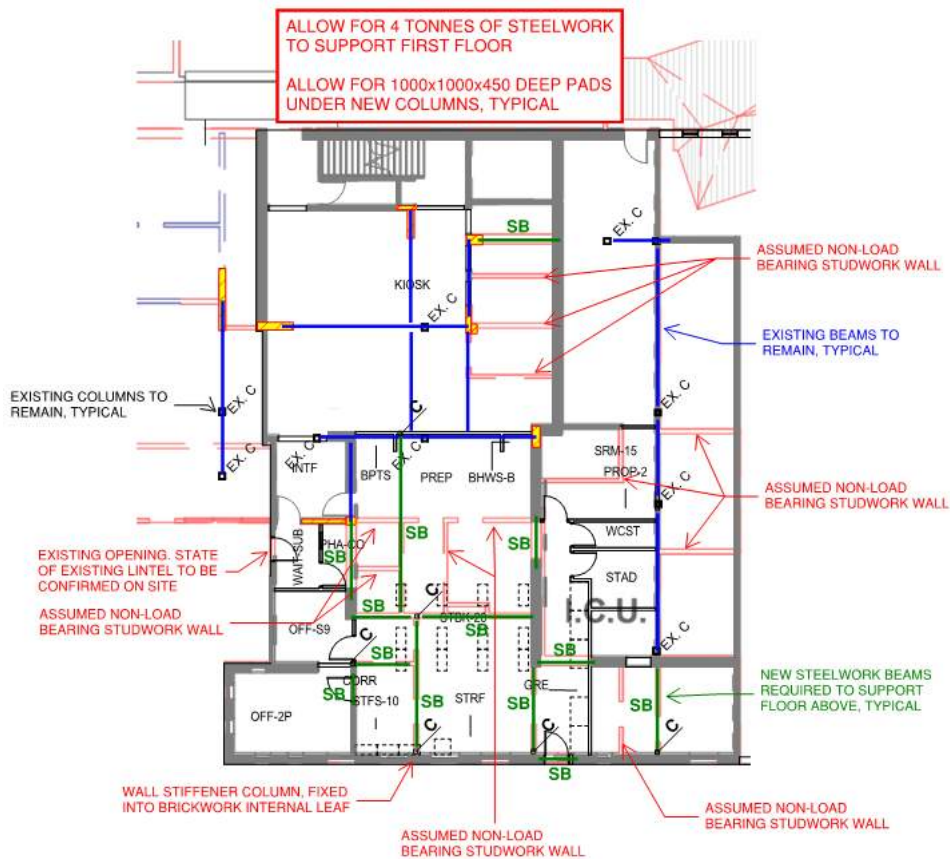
ED/ICU proposed floor plan overlaid on demolition plan, showing locations of steel beams and columns required as a result of load bearing wall removal.
